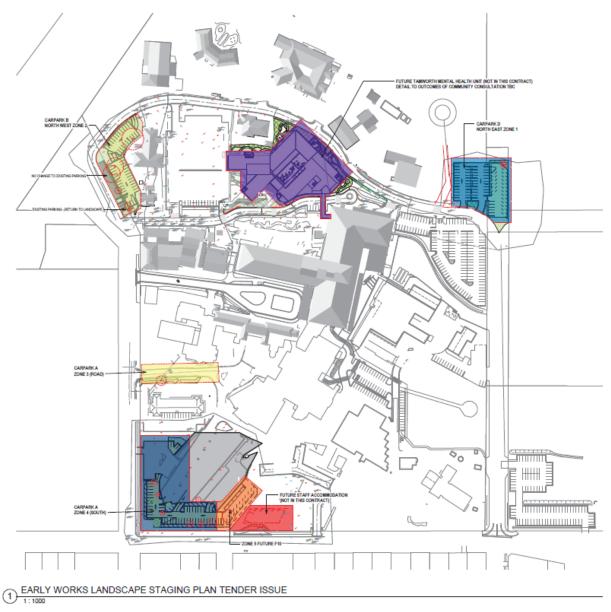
Site plan of subject area showing proposed development of Tamworth Mental Health Unit Building and associated carparking zones. The Acute Services Building (ASB) is located to the south of the proposed Mental Health Unit.
